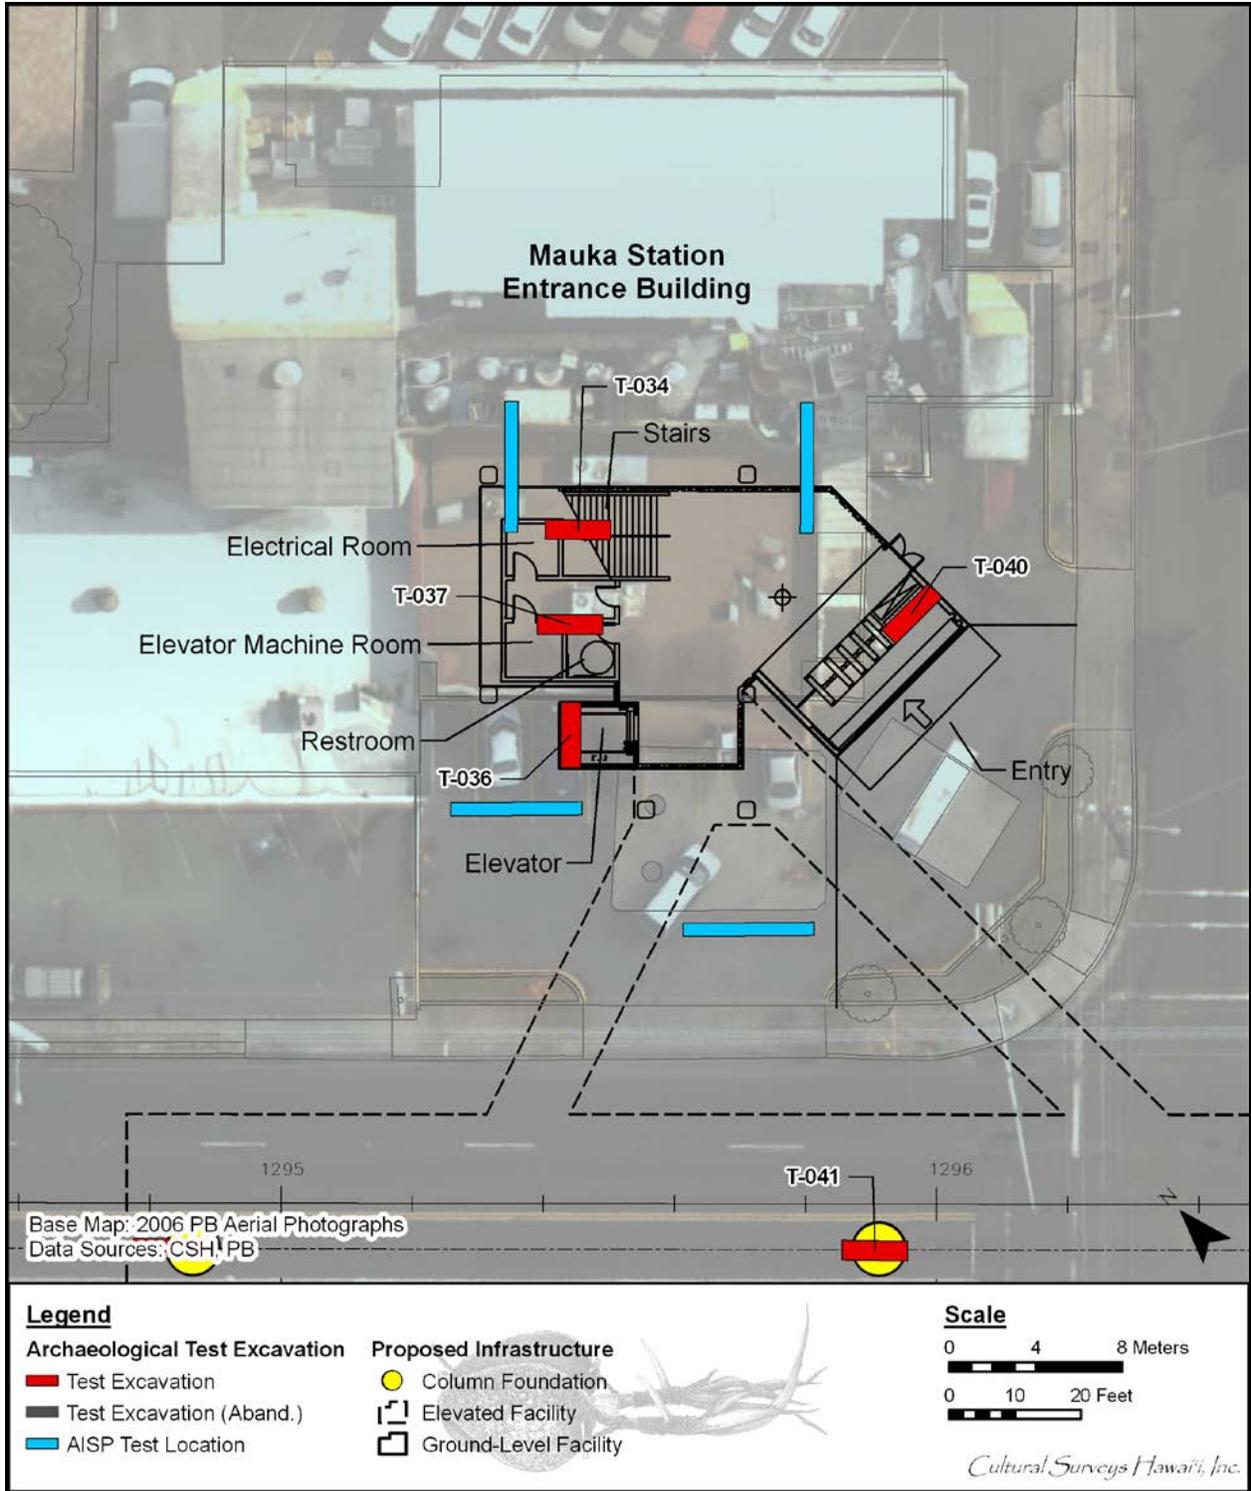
Kalihi Station, detail of (*mauka*) Station Entrance Building showing locations of proposed AISP and actual AIS test excavations
